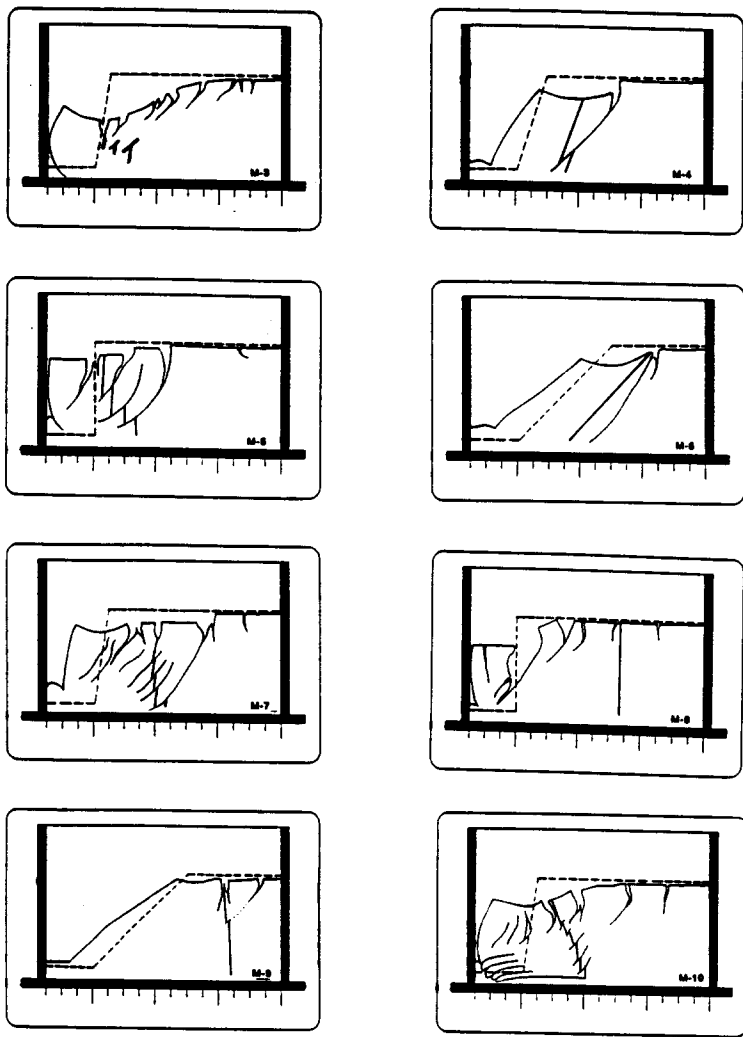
Profiles of models on weak foundations after failure in the centrifuge.
